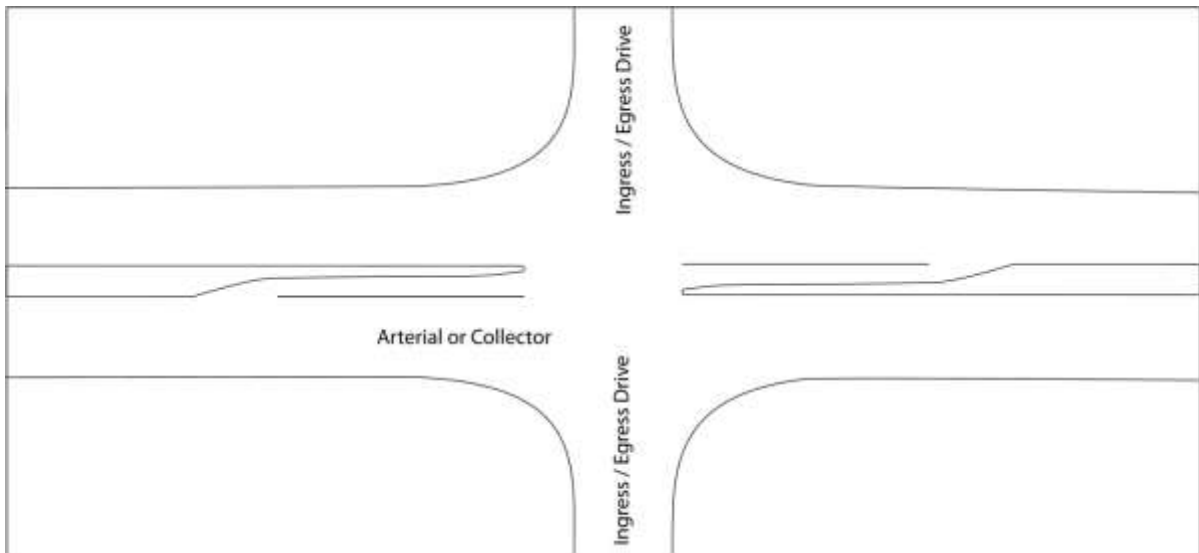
Divided Roadway, Aligned Driveway Locations – Median Opening
